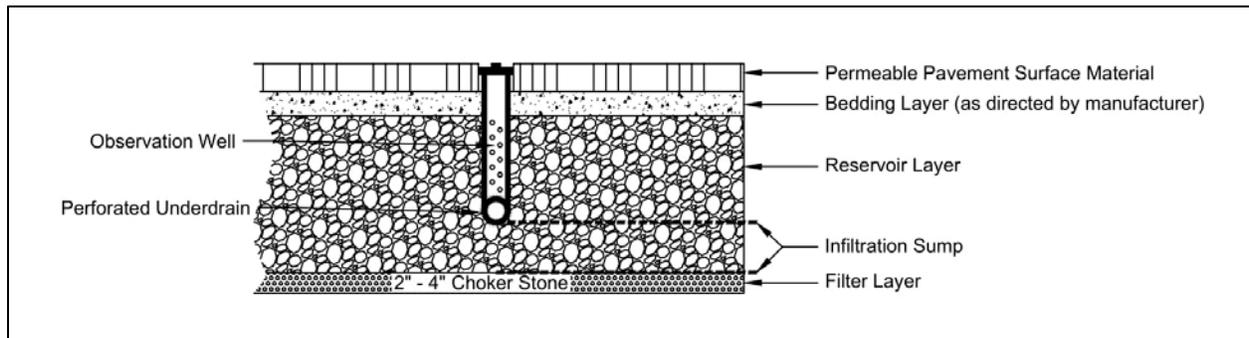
Cross-section of an enhanced permeable pavement design with an underdrain.
